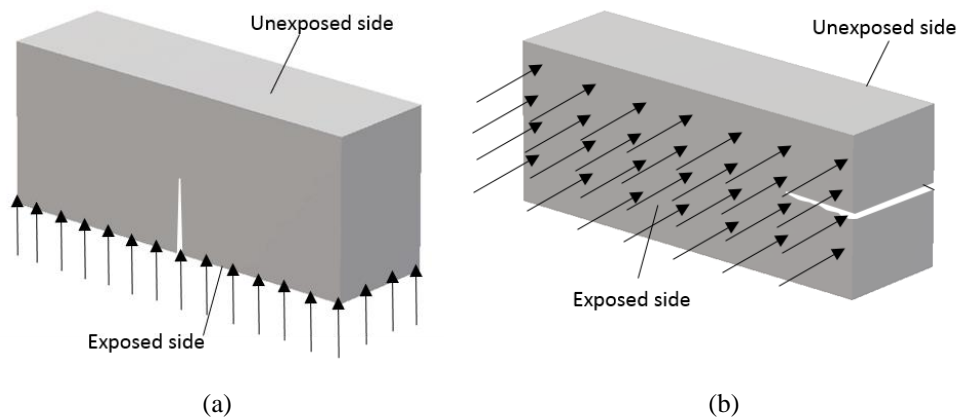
Orientation of heat flow relative to cracks for (a) beams and (b) walls.
